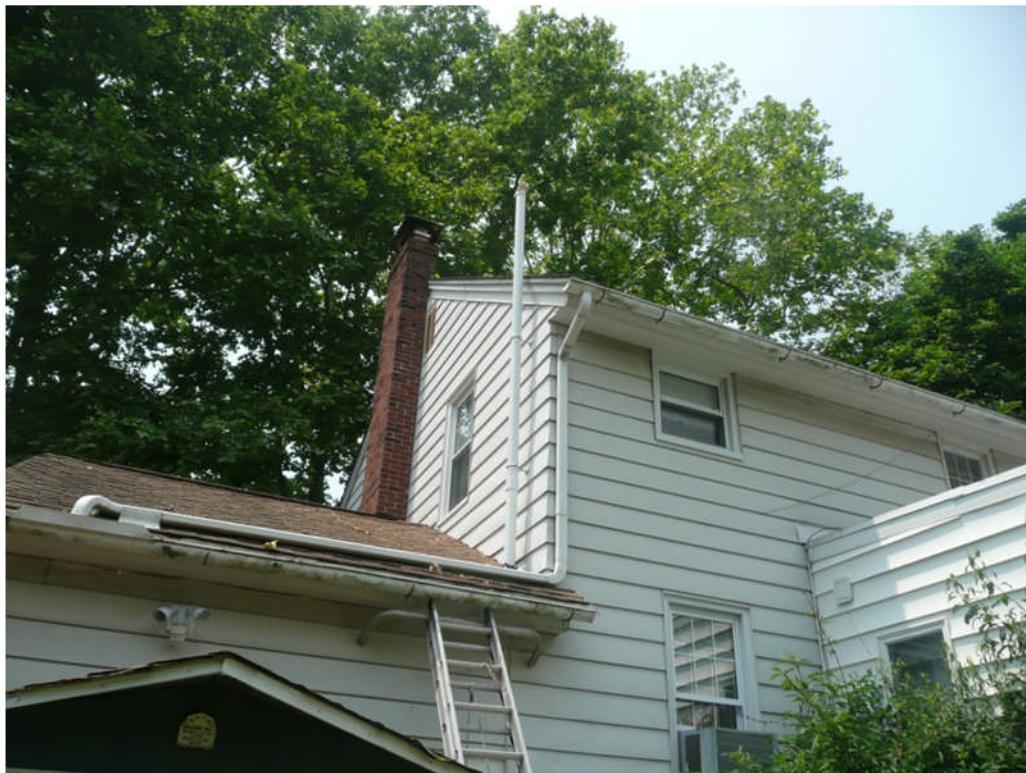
View of sump ventilation piping which extends through garage roof and past second floor eaves.
